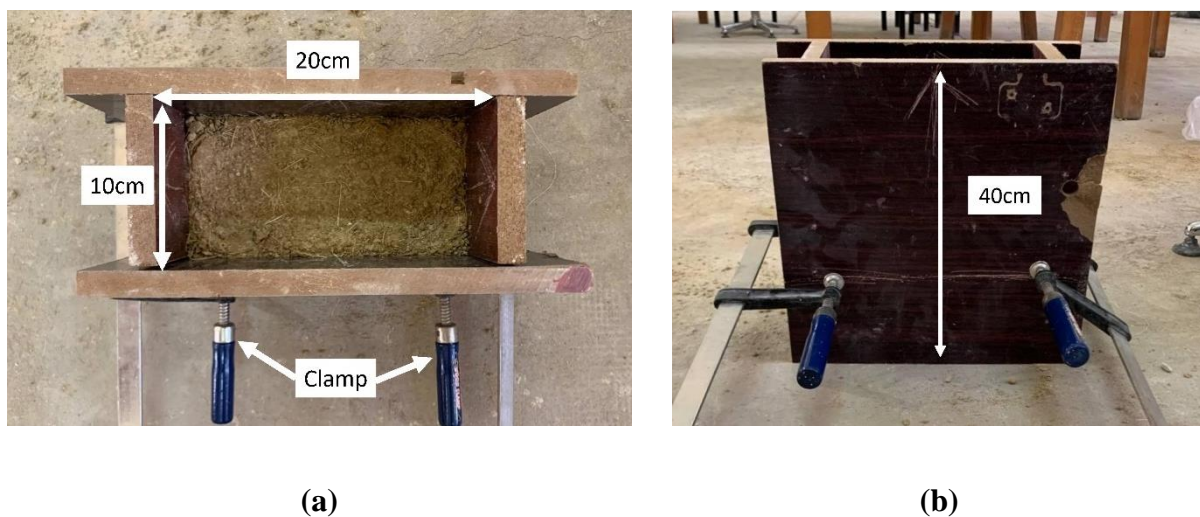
The manufactured wooden mold dimensions (a) and (b)
